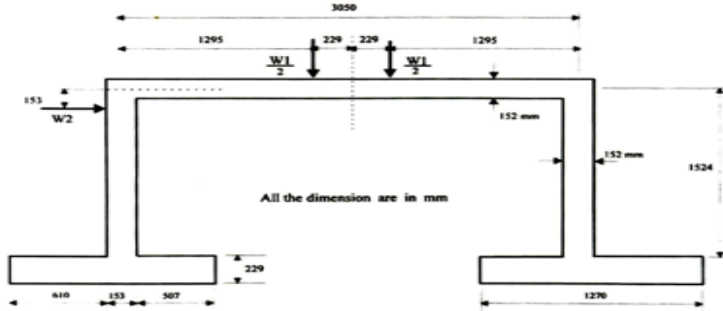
Details of test frame [Cranston and Cracknell \(1969\)](#)
